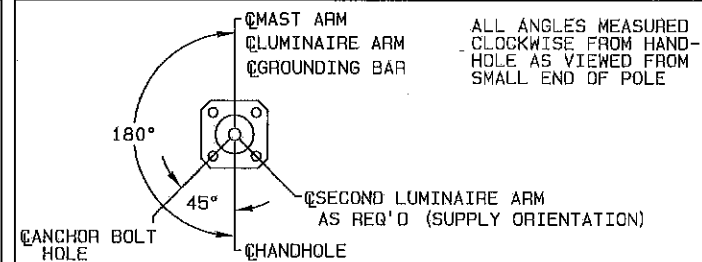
LUMINAIRE ARM ATTACHMENT
